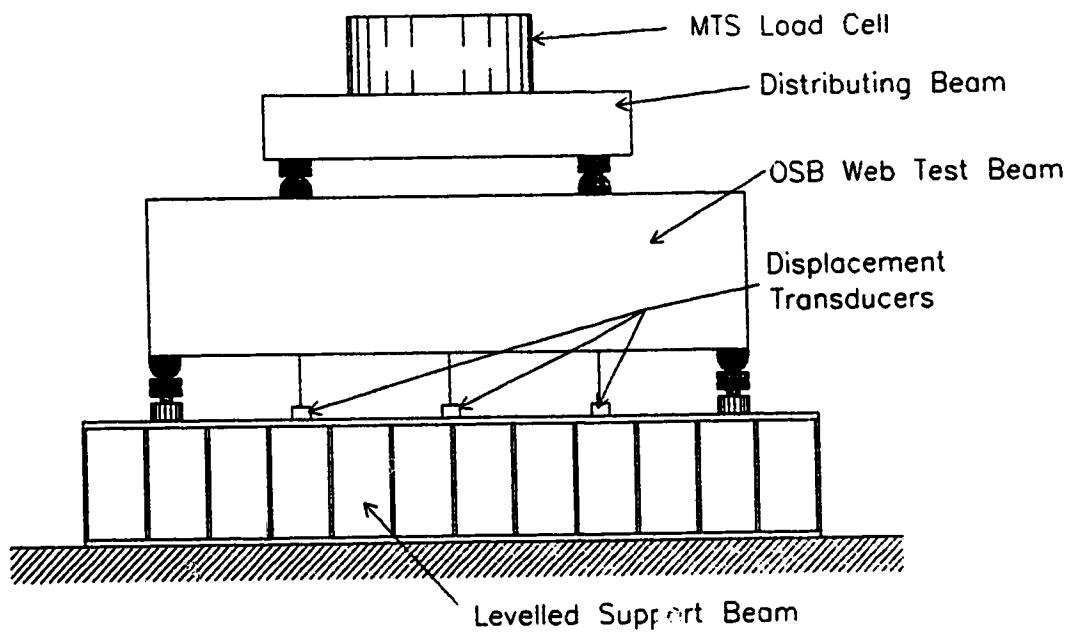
Test set-up showing MTS testing machine, distributing beam, load blocks, reaction blocks and levelled support beam
